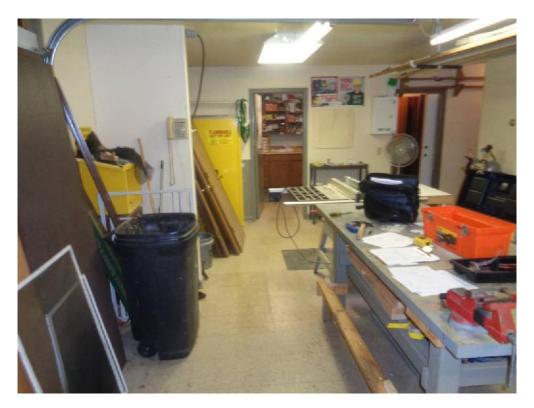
View of beige floor tile (FTA, mastic is asbestos containing) found throughout the Oak View Court maintenance building.
